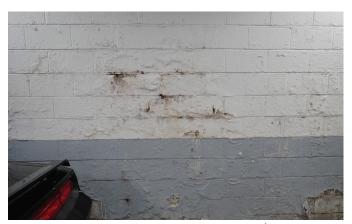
Water intrusion through CMU wall before grout injection (Picture courtesy of Martin/Martin Consulting)
